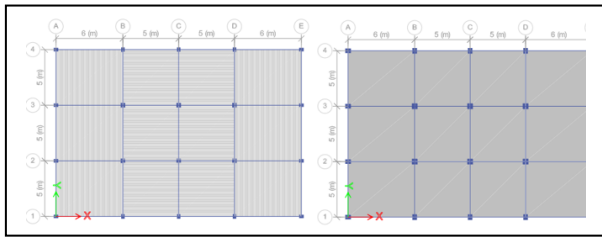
Typical floor plans of the two slab systems: (a) ribbed slab illustrating rib orientation (Models A and B); (b) solid slab with dropped beams (Model C).
